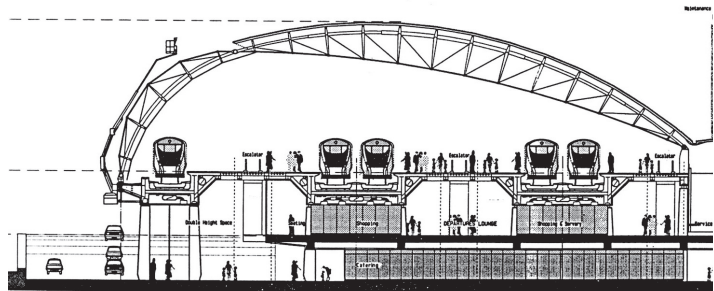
Waterloo International, section through the platform hall, source: <http://eat-a-bug.blogspot.de/2010/07/geometry-of-structural-form.html>
